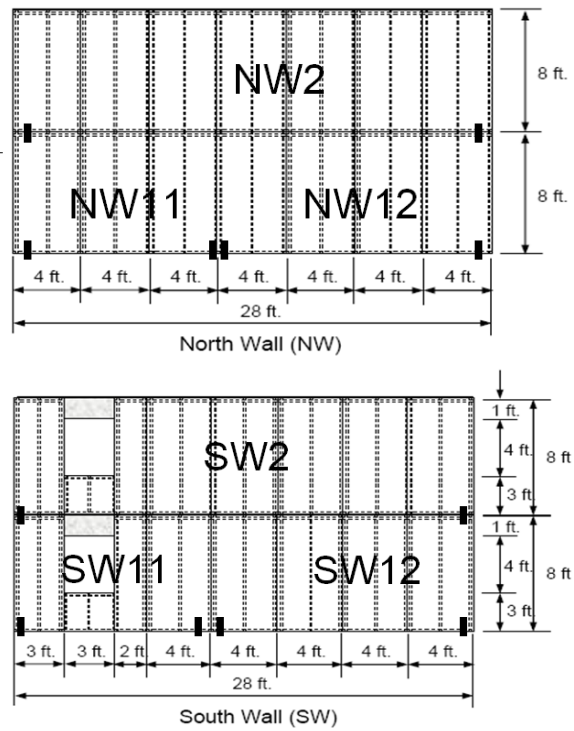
X – direction elevation view and dimensioning of the small two-storey woodframe building (Rosowsky and WeiChiang, 2007)
